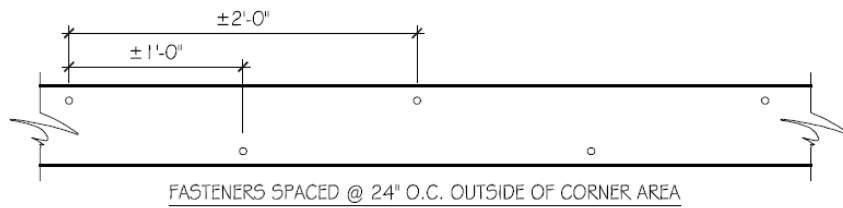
B - TYPICAL ROOF EDGE WOOD BLOCKING - SCREW FASTENER ANCHORAGE
